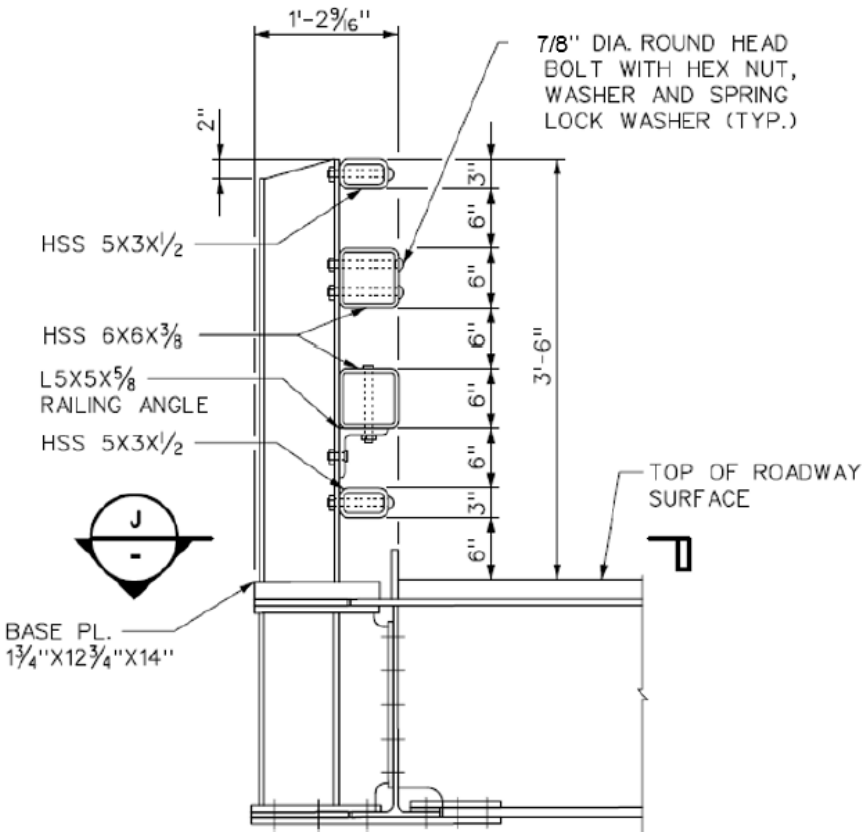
TL-5 Steel Rail for Suspension Bridges [21]
